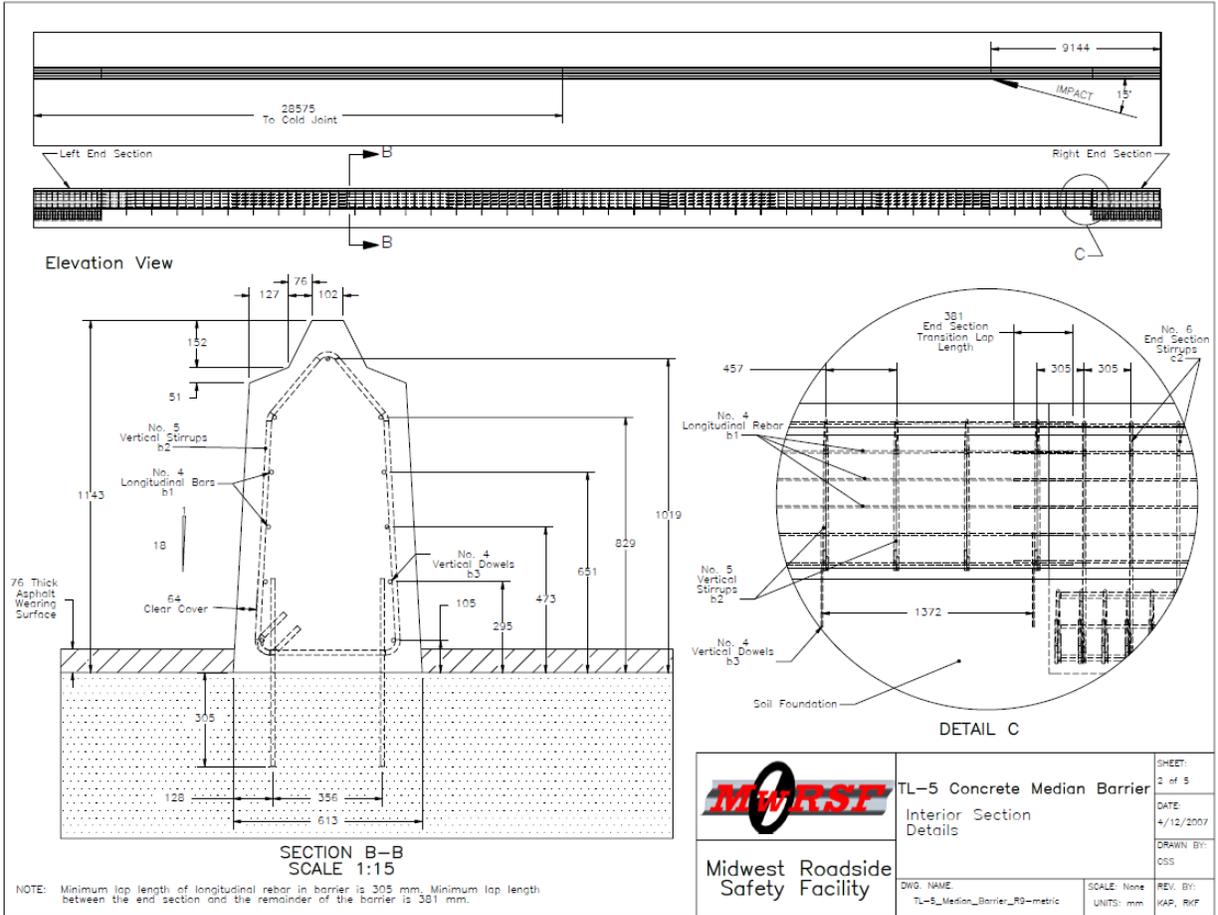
Layout detail, Test No. TL5CMB-2 [8].
